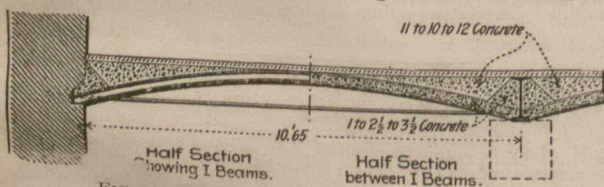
THE MELAN SYSTEM OF IRON AND CONCRETE FLOOR CONSTRUCTION.
